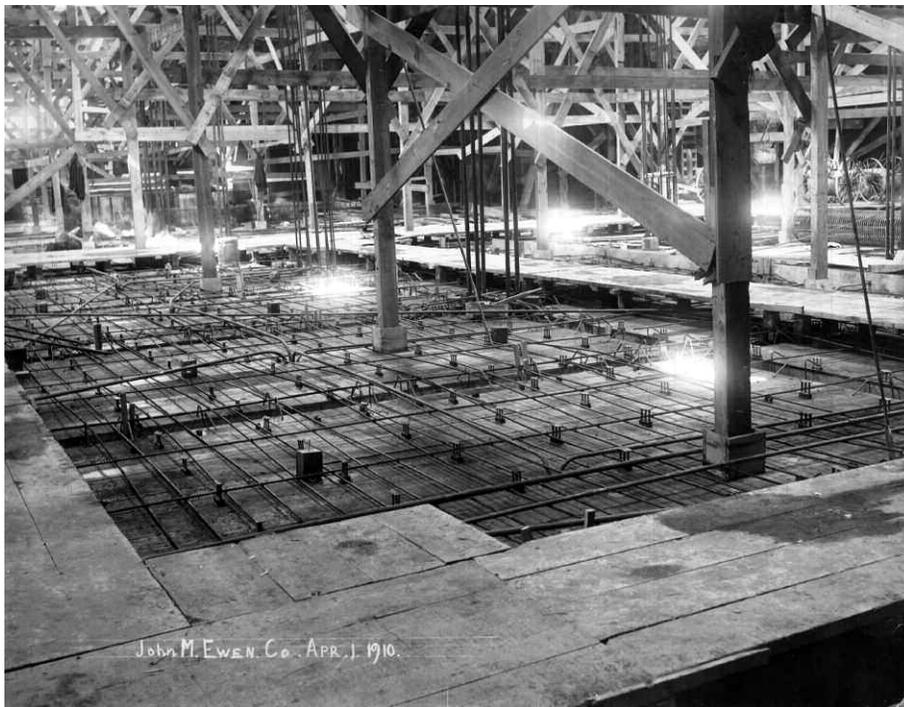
M/B Bar twisted square-steel bar reinforcement, Plymouth Building, April 1, 1910. The photograph of the slab construction was taken at an atypical one-way slab near the elevator opening. Typical floor slabs had the same size and spacing of steel reinforcement in both directions. Courtesy of Historic Plymouth Building, LLC.
